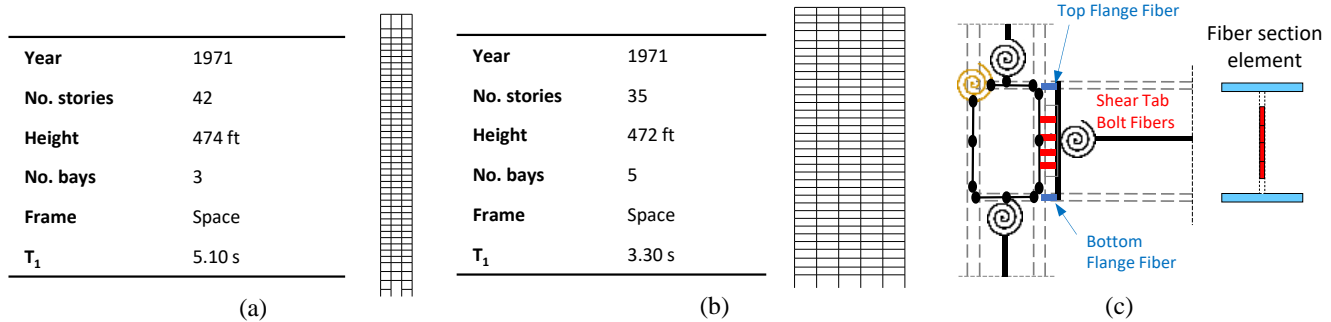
Tall building archetypes of similar completion year and height: (a) building A (flexible archetype) and (b) building B (stiff archetype). (c) Structural model of welded connections using a fiber section with *SteelFractureDI* for the flanges.
